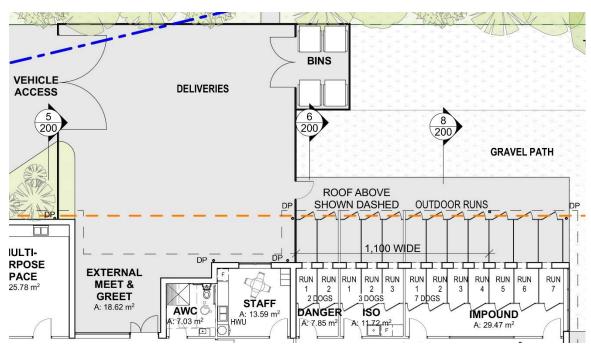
B: DA approved outdoor enclosure and paved outdoor runs for dogs (source: F&J Tepa)
